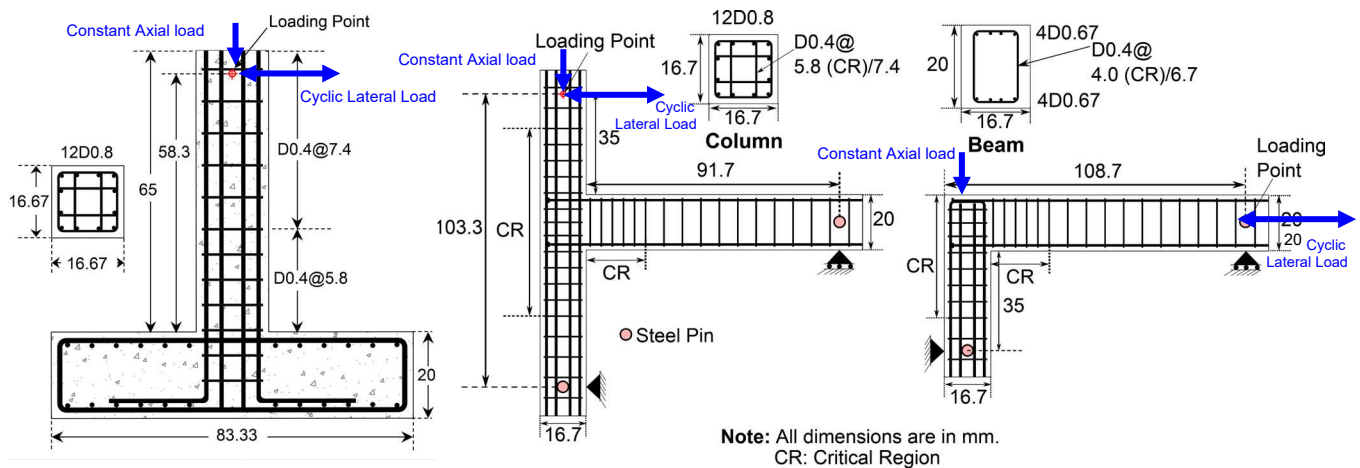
Specimen details: (left) Column, (middle) Exterior beam–column joint, and (right) Knee beam–column joint.
